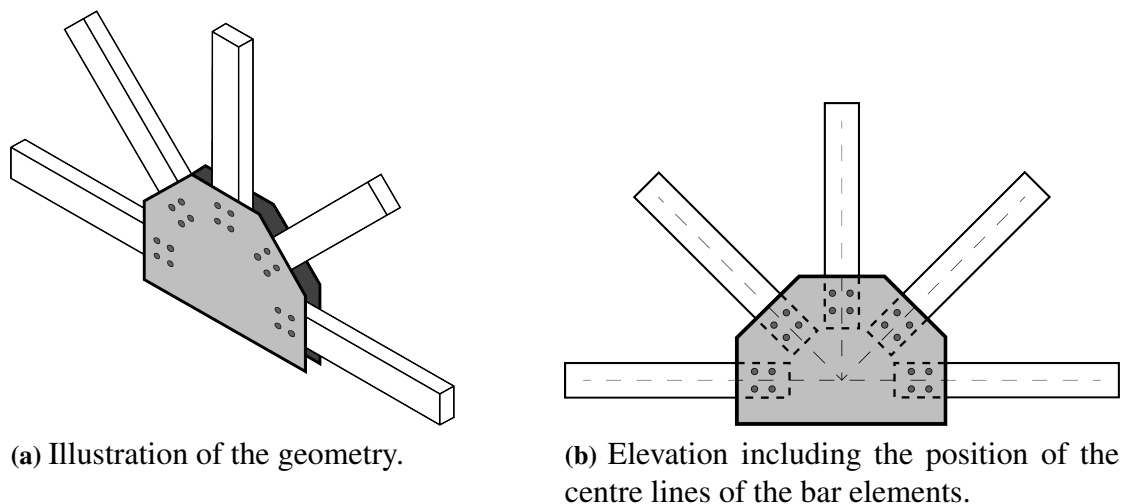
First iteration of the connection between bar elements in the steel truss.
